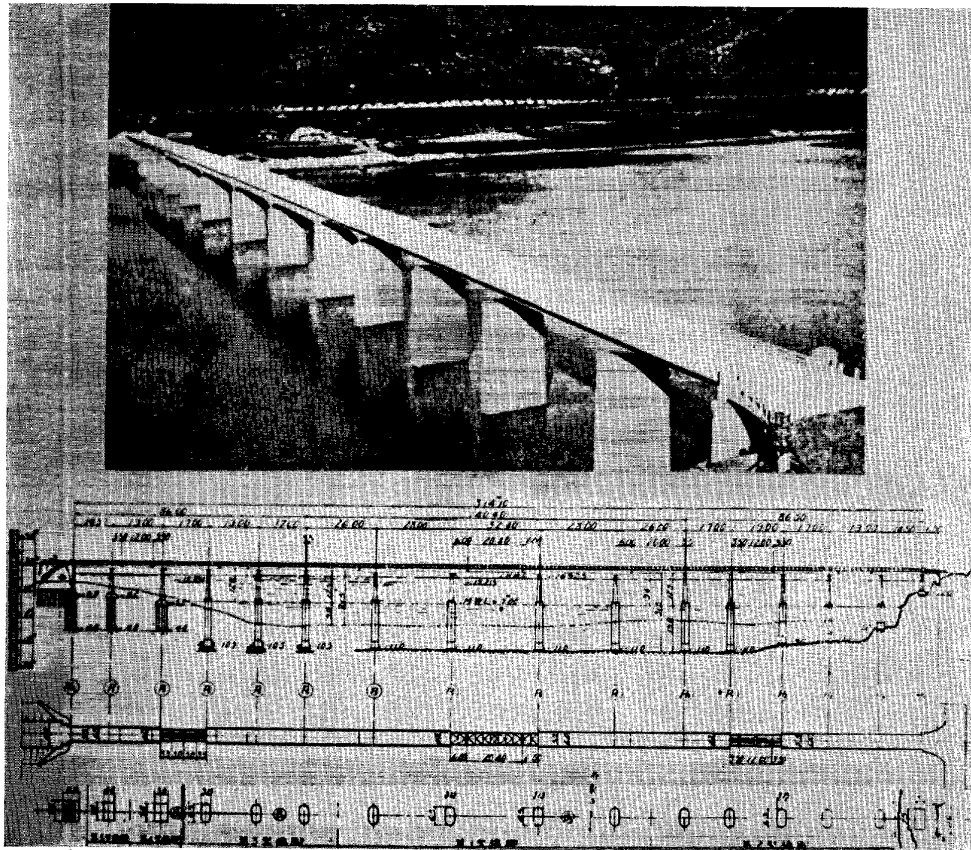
Bridge over Naktong-gang, west of Ch'angyong (Shōnei). Reinforced concrete bridge. Probably looking N. 1936.
